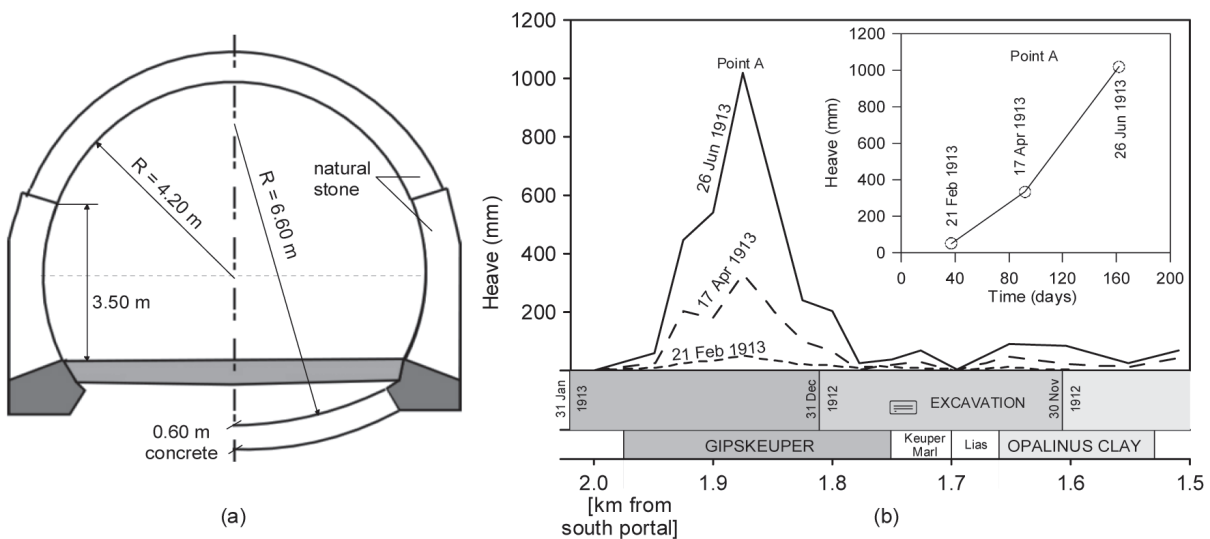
(a) Standard cross-section in Hauenstein Base tunnel. (b) Floor heave during construction (original Figures by Wiesman, 1917; modified after Amstad and Kovári, 2001).
